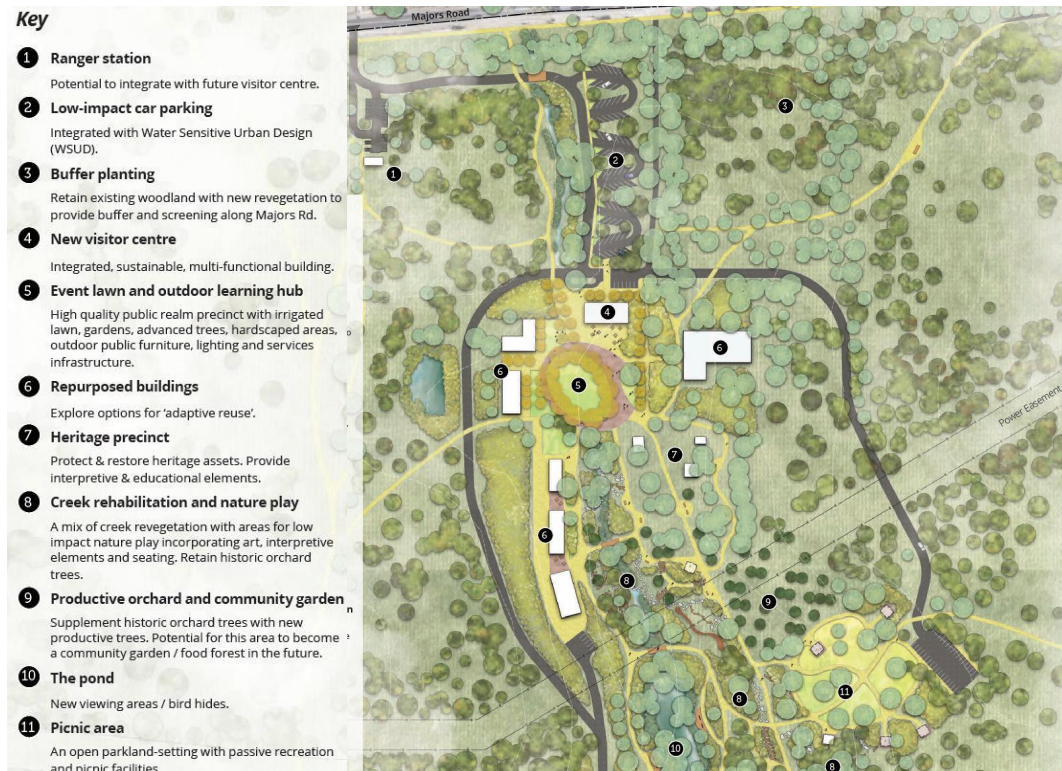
Glenthorne 'Hub' Plan (from Master Plan)
